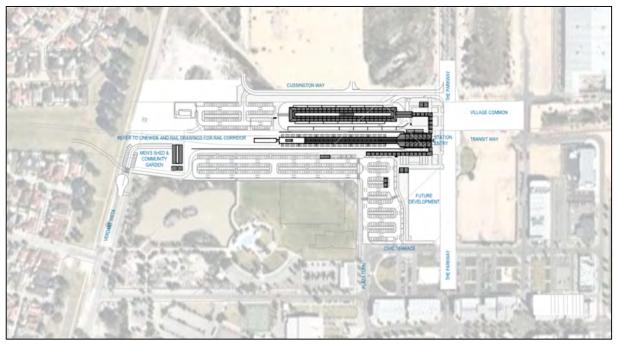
Extract of architectural site plan 25-A-291-AR0012_A indicating site locality.
